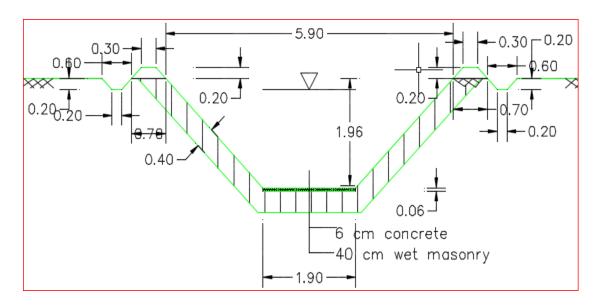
Plan & section of underground pond bill of quantity for HH pond lined with masonry
